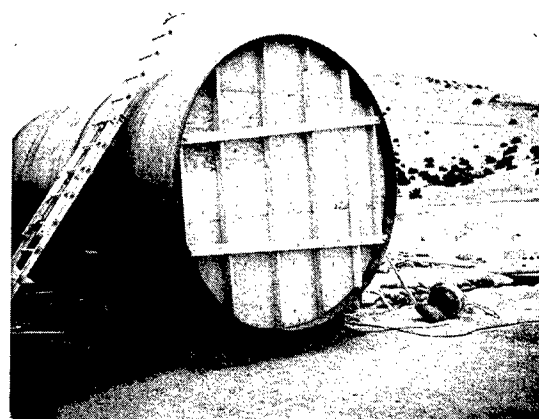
Ten-Foot Diameter Steel Pipe with Plywood End Covering
